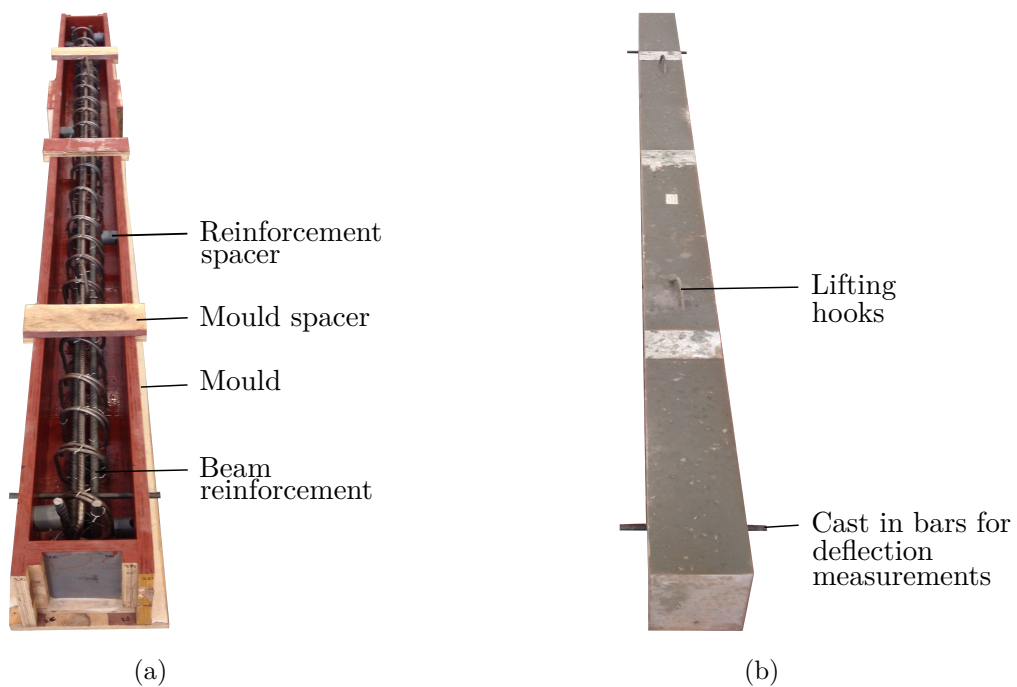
(a) RB specimen moulds, and (b) Demoulded RB specimen
